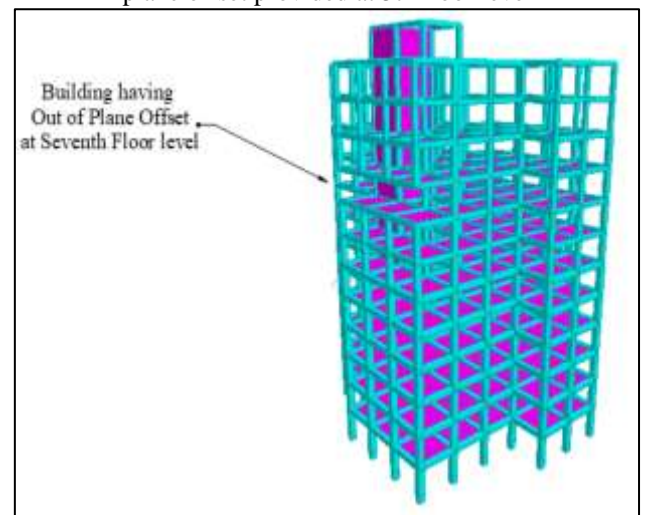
OPO Case 5 - Residential Apartment having out of plane offset provided at 7th floor level
